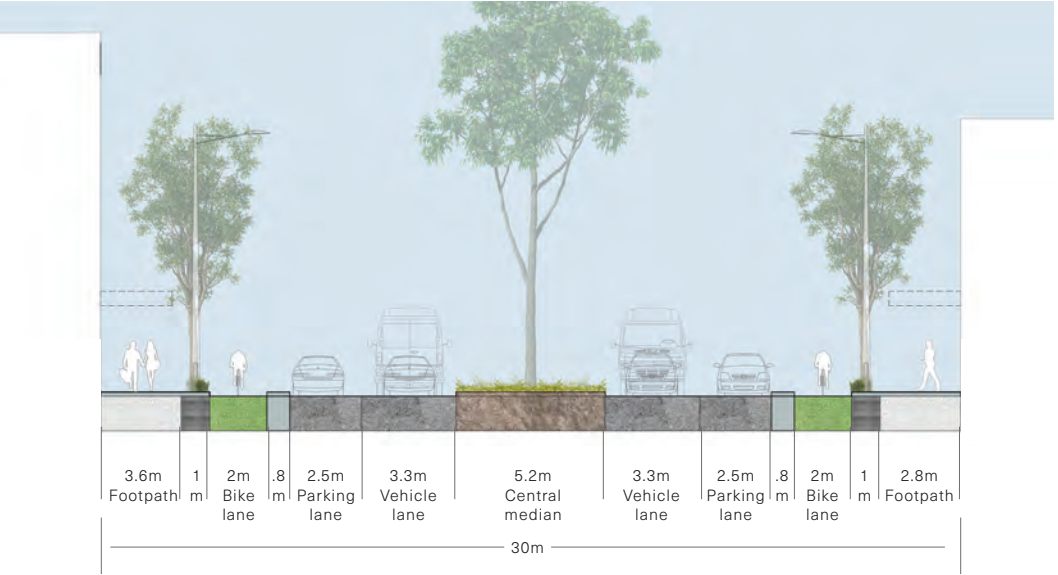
Section A-A' of Mercer Street central block showing the proposed condition
